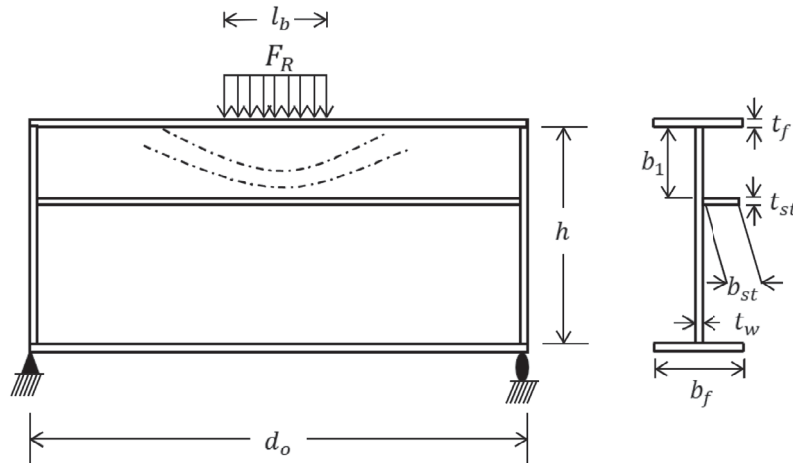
Notation used for longitudinally stiffened steel plate girder webs subjected to concentrated loading.
